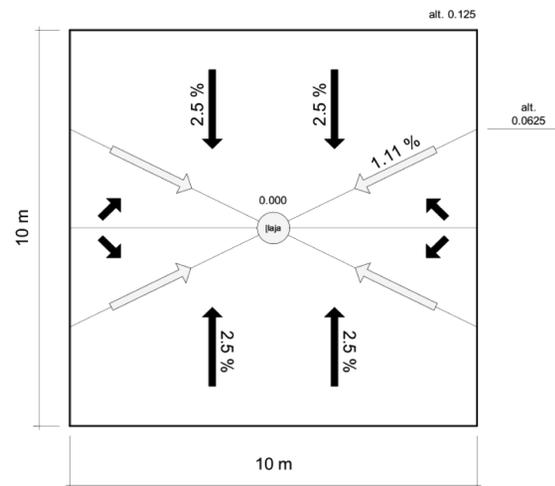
Roof slope model, when the height of one or two opposite edges of the roof is limited
